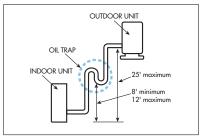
Figure A. Example: 25 ft. maximum elevation. Must install trap inverted.
